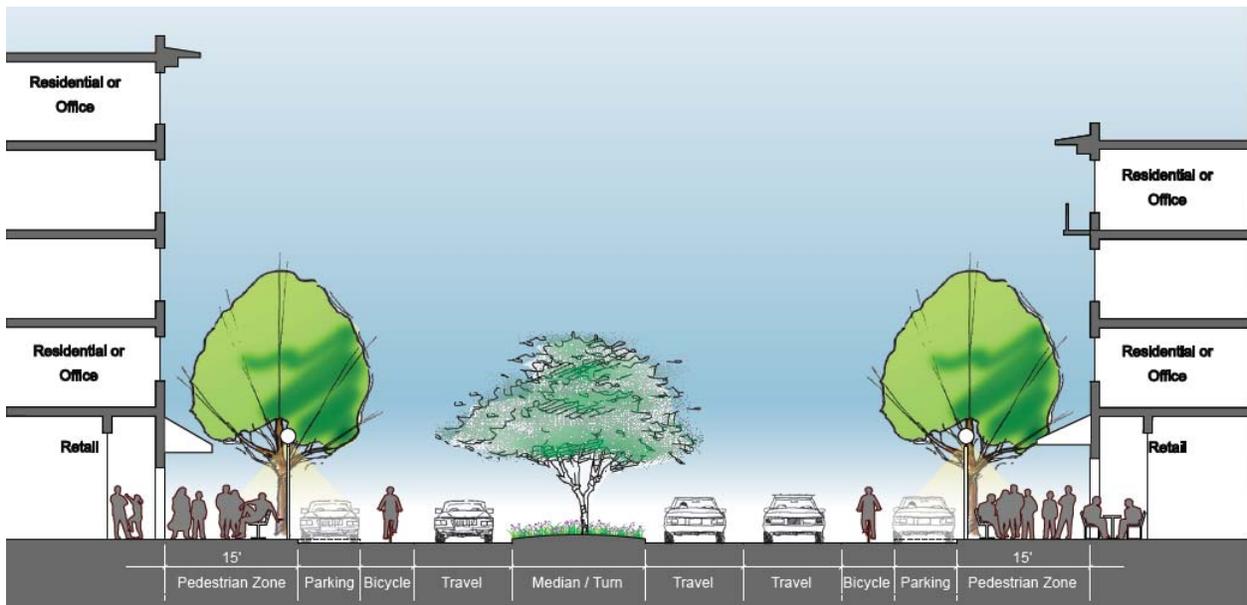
Folsom Boulevard between 62nd Street and 68th Street
